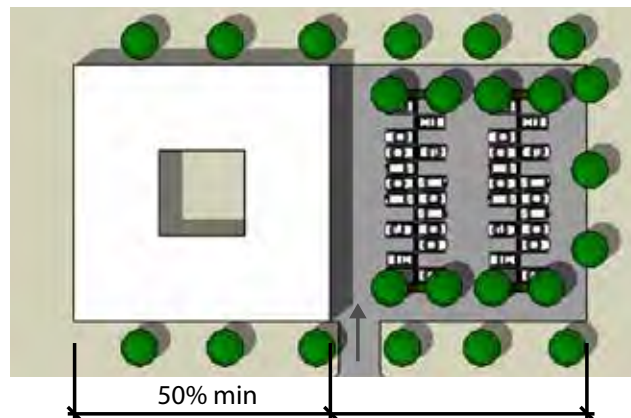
d.1.a.ii. Minimum street frontage for buildings without a central courtyard.
